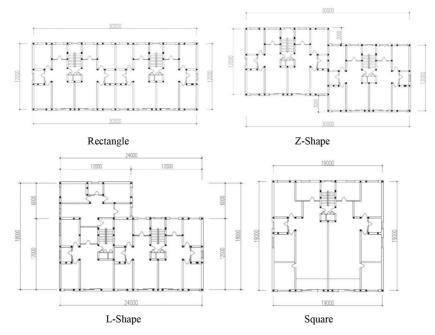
Floor sizes of slab blocks of common plan shapes (The orientation is up North, down South).
